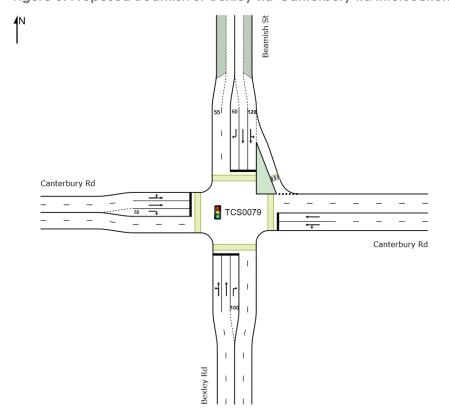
Proposed Beamish St-Bexley Rd-Canterbury Rd intersection Layout
